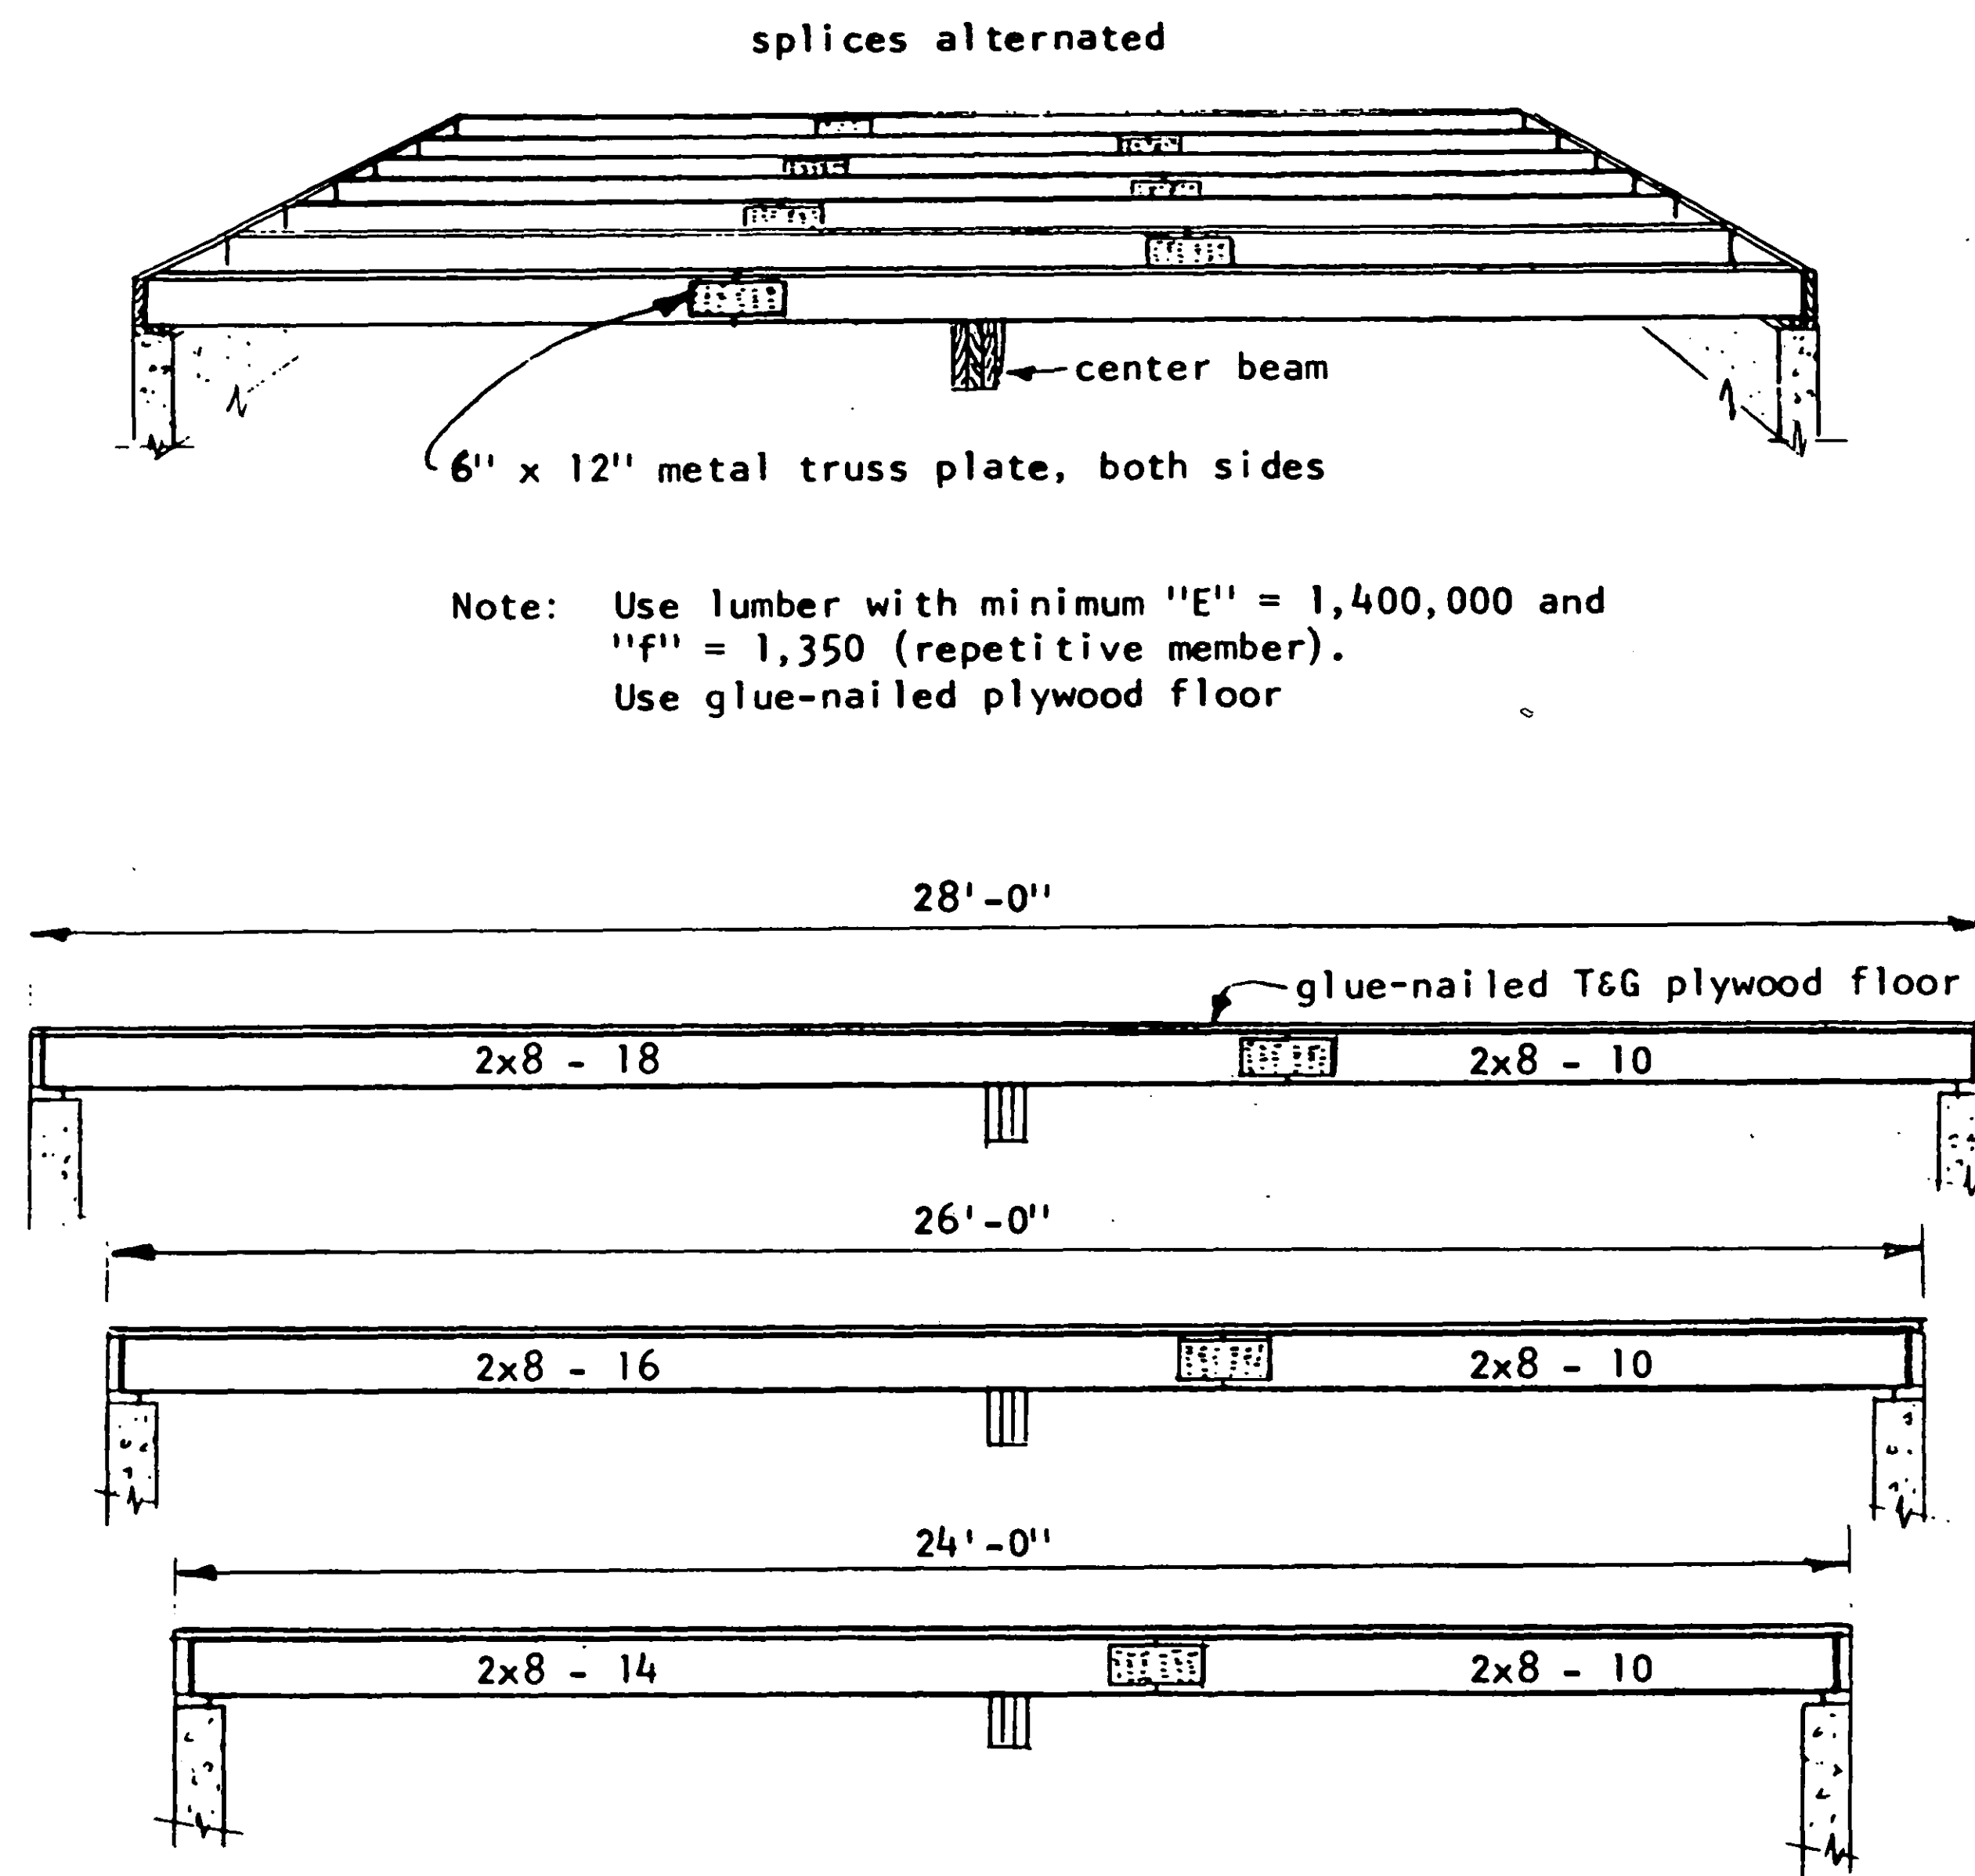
D. Off-center spliced joist designs span further than simple joists of the same dimension
